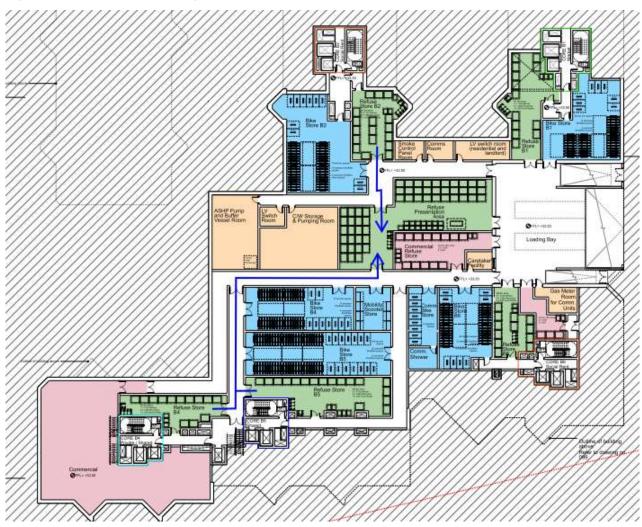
Routes from Building Waste Stores to Plot B Waste Presentation Area
